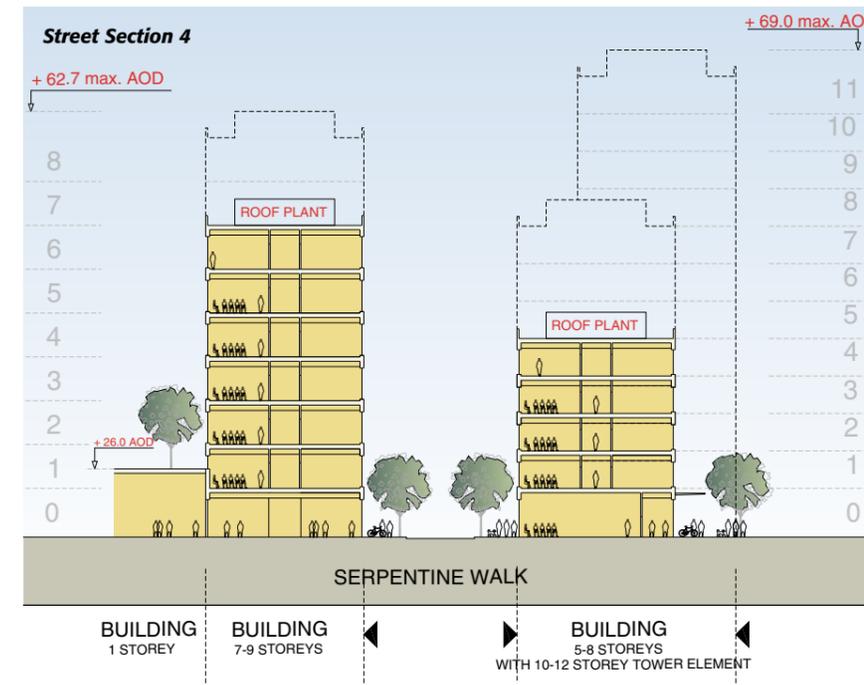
Section 4 illustrates a section along Serpentine Way at Broadstone Gate. The buildings are 7-9 storey on the south side of the route and 5-8 storey in height with 10-12 storey tower element on the north side. Figure 4.6 establishes that the buildings will be a maximum of 62.7 and 69.0 metres above ordnance datum respectively, including any rooftop plant.
